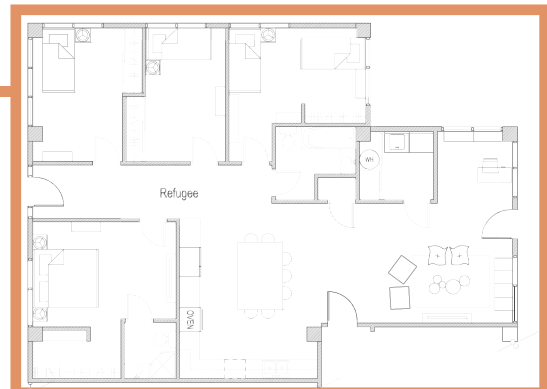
Apartment floorplan and furniture layout by Valerie Jenkins.
